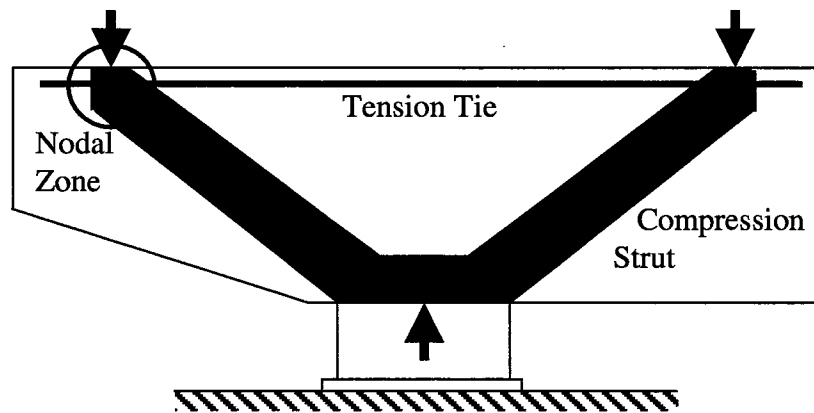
Bent Cap Structure and Tied-Arch Truss Model.
